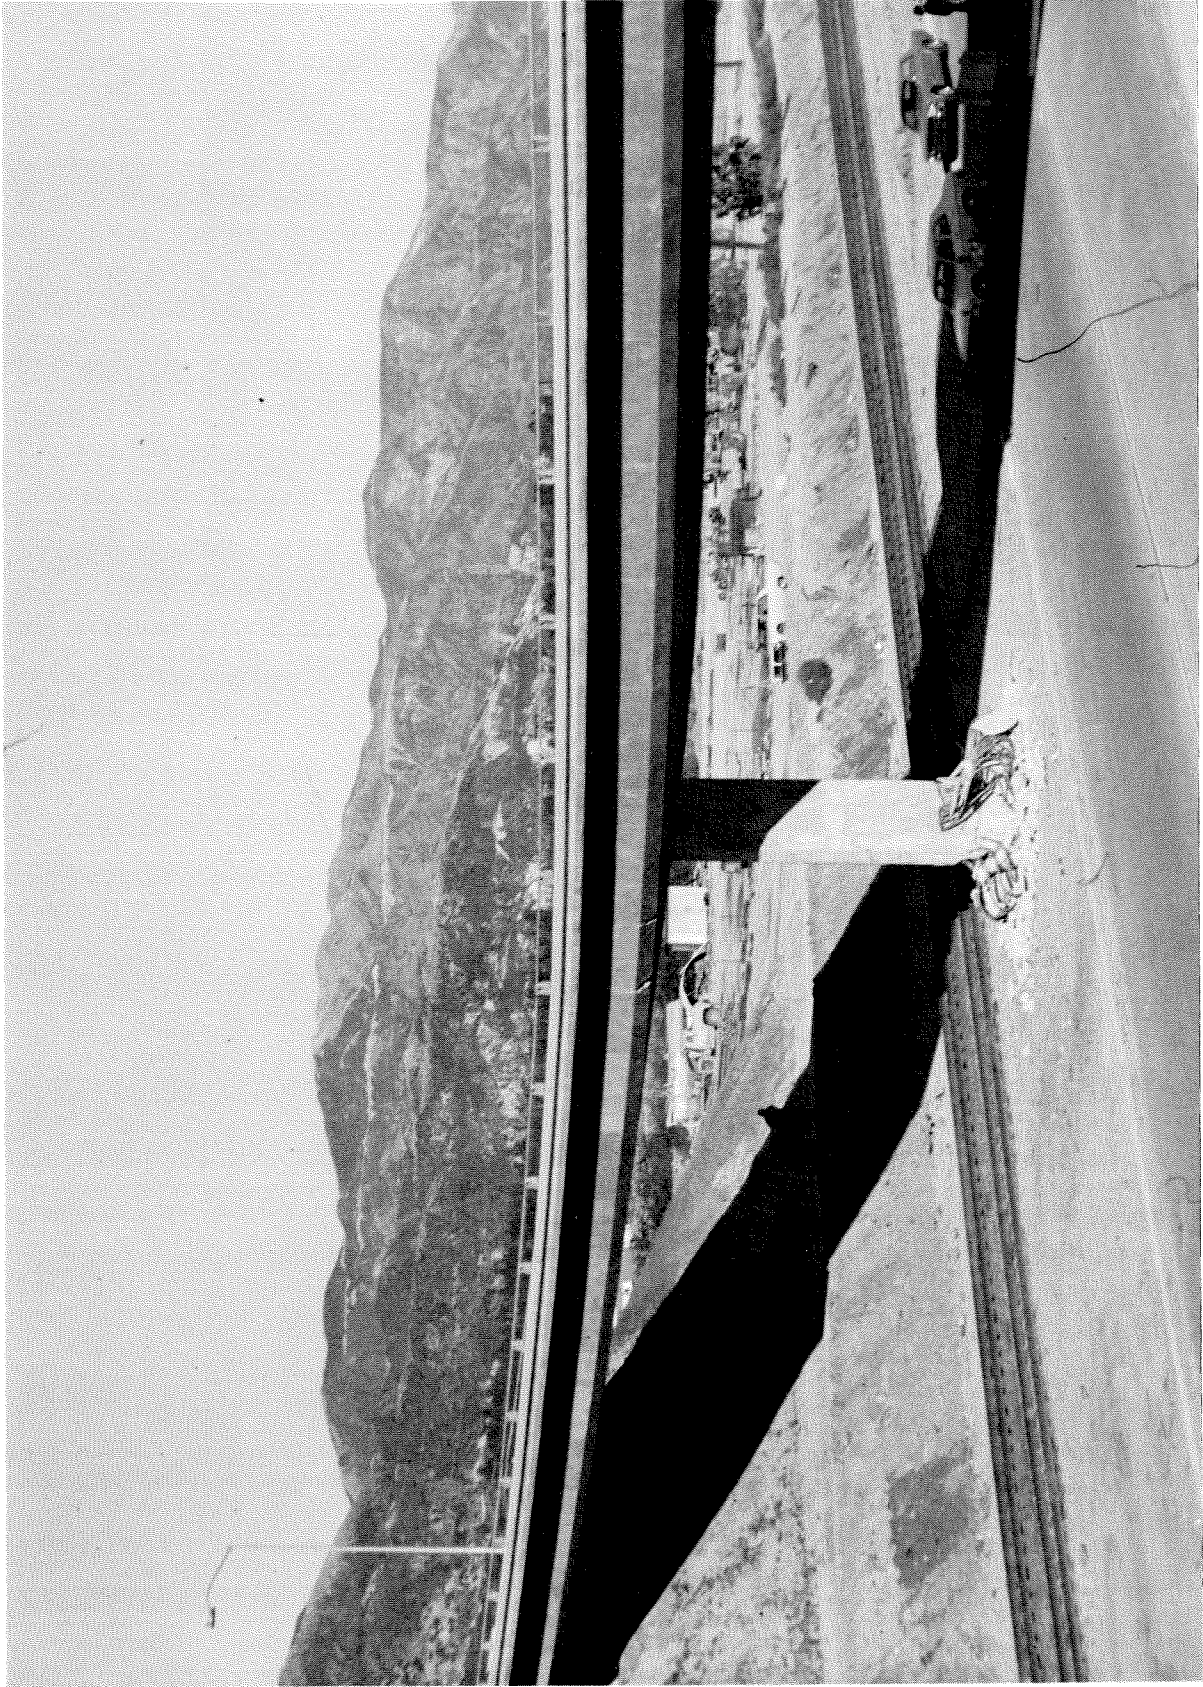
37a San Fernando Road overhead transition bridge showing damage to the base of the single column. The top of the column was reported to be undamaged.
